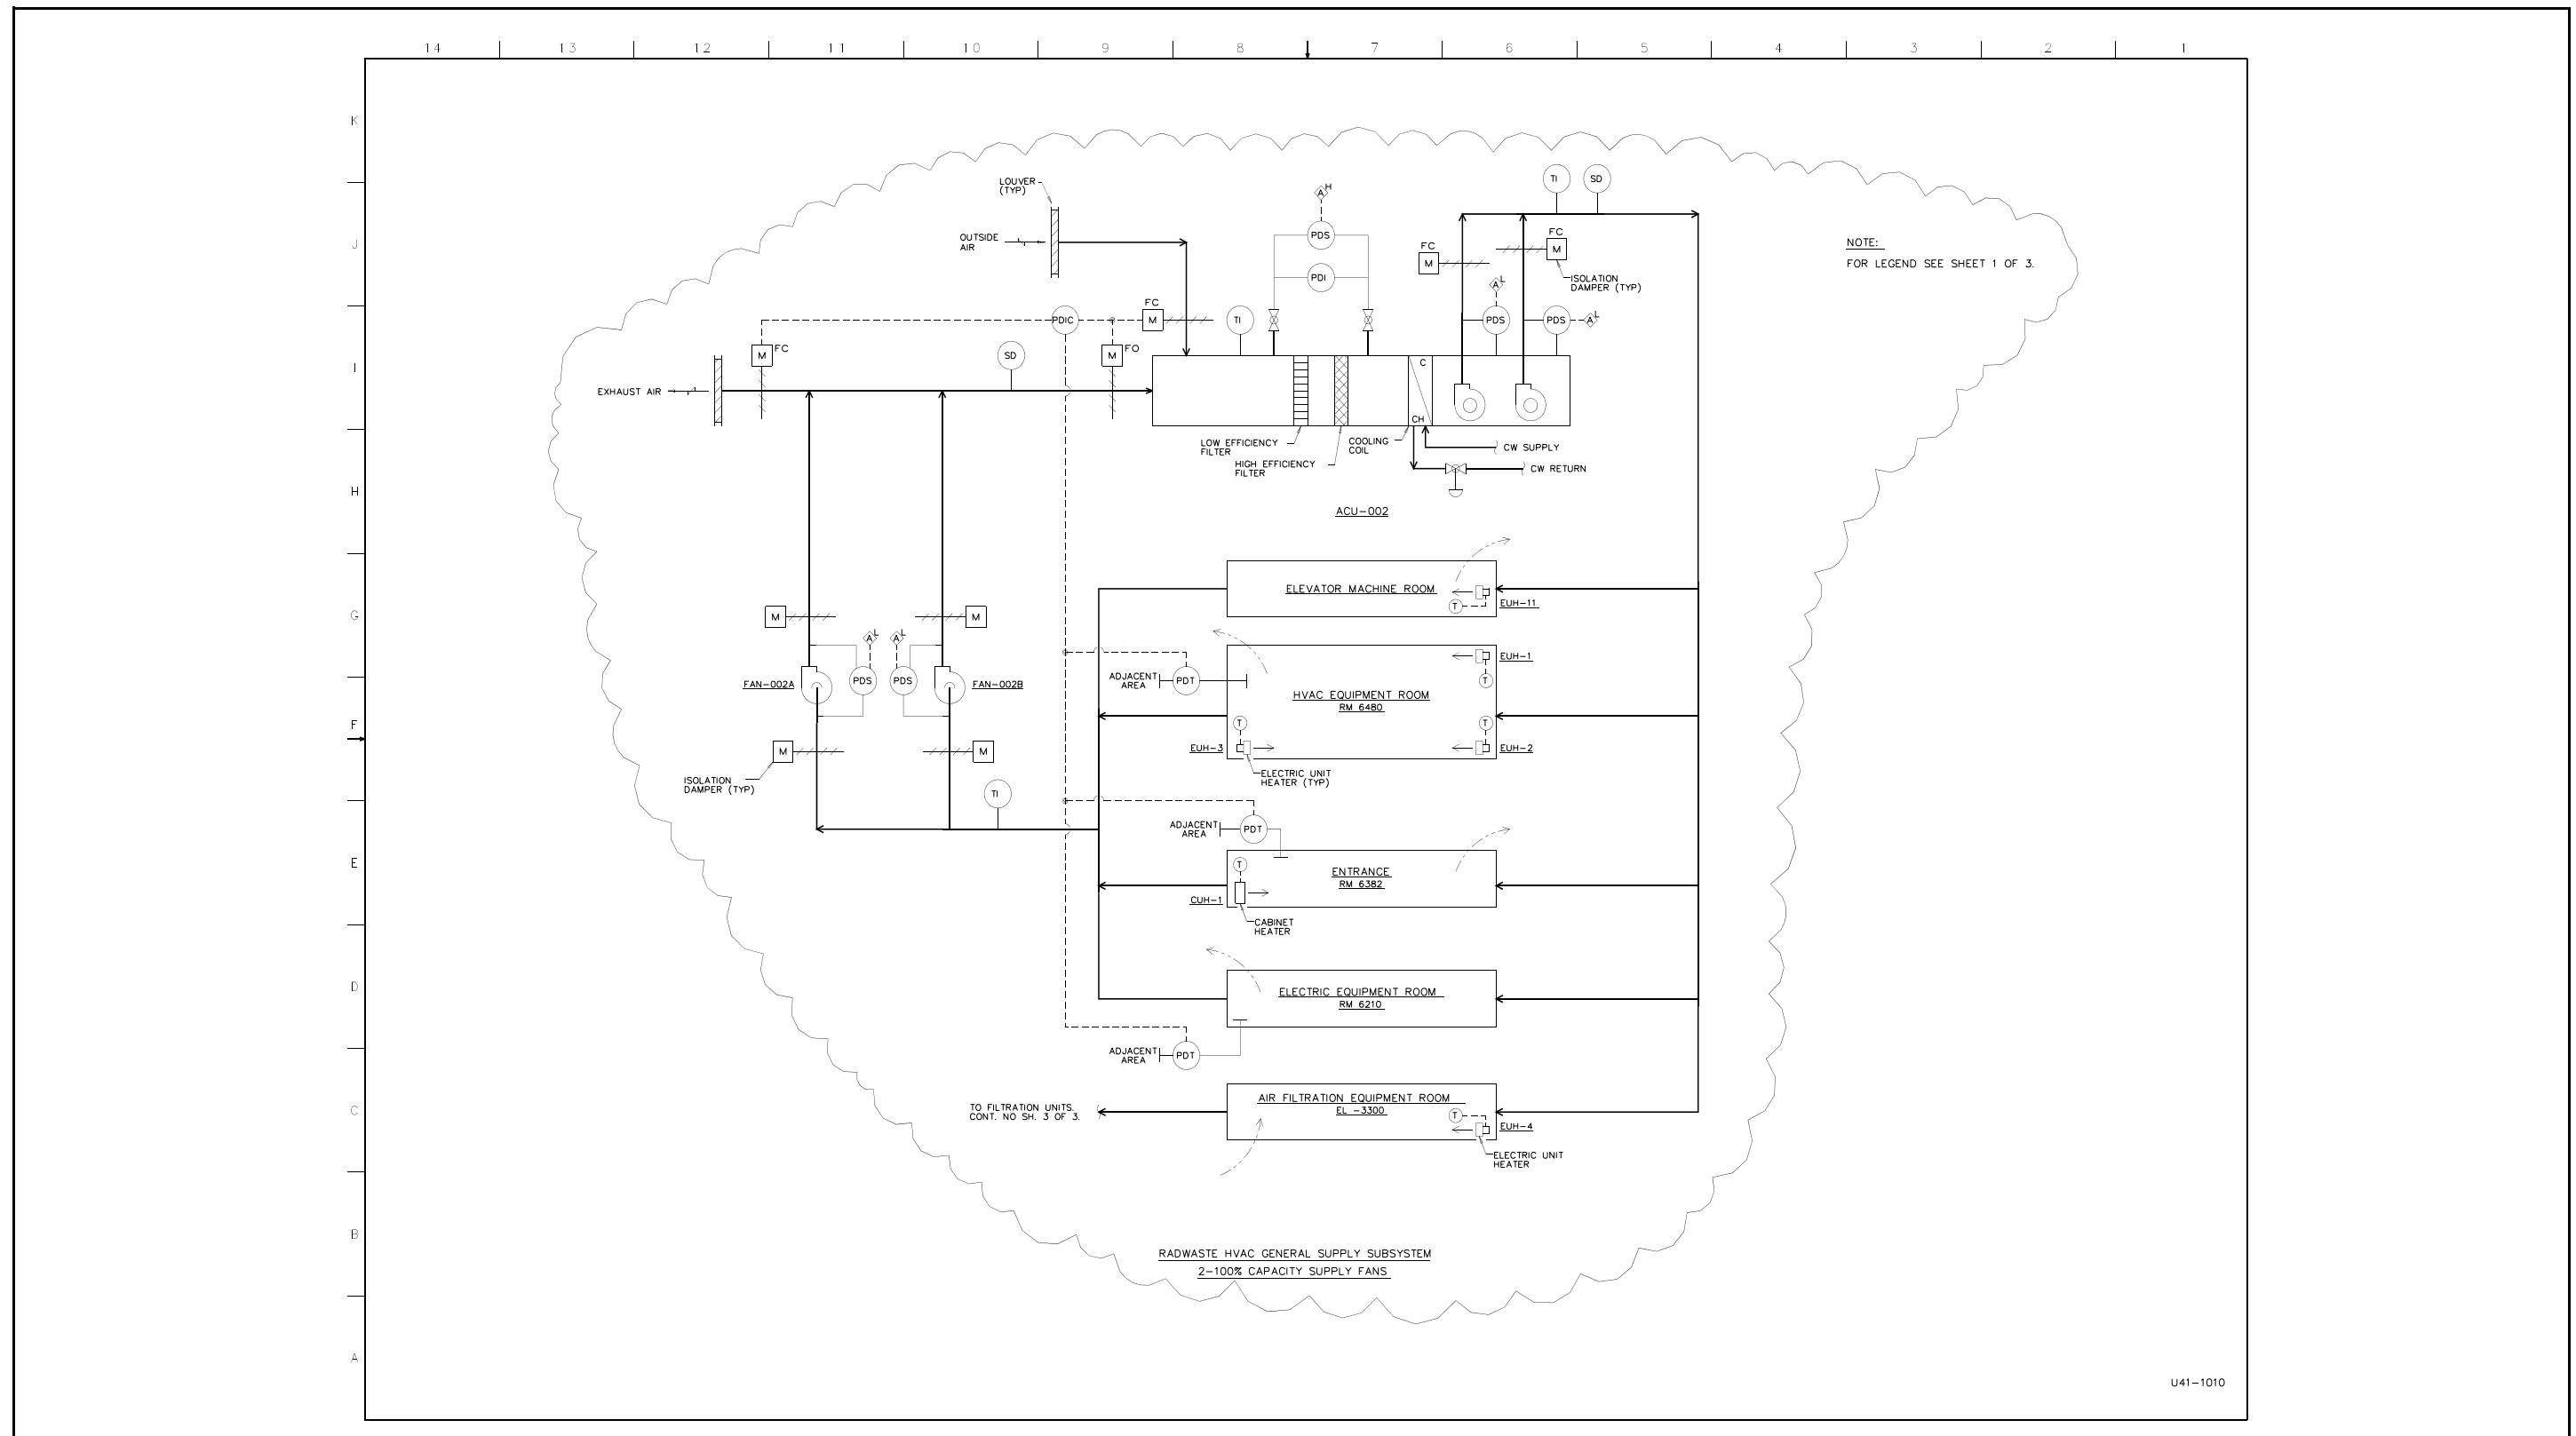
Radwaste Building HVAC P&ID (Sheet 2 of 3)
